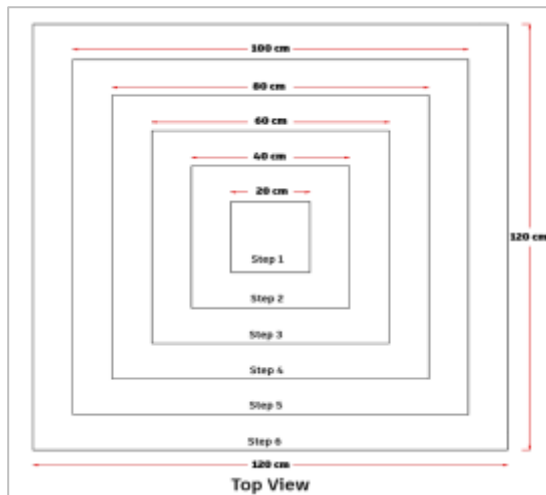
Top View of Stepped Cascade Aerator Used (All Dimensions are in cm).
